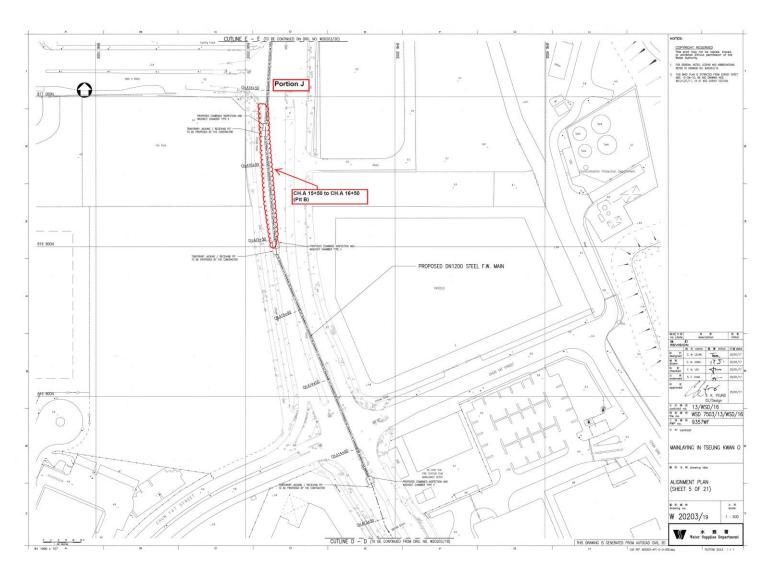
Location Plan for Portion J – CH. A15+50 to CH.A 16+50 (Pit B)
